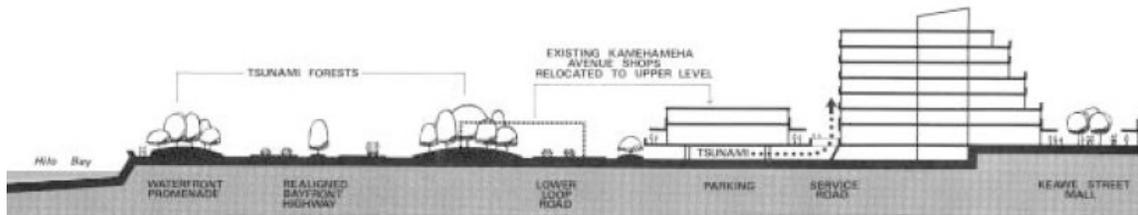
Hilo Downtown Redevelopment Plan, Hawaii. Development of tsunami forest is to slow down the water currents and relocation of parking lot and avenue shop to upper level is to provide evacuation area and steering tsunami waves (Eisner and NTHMP, 2001a).
